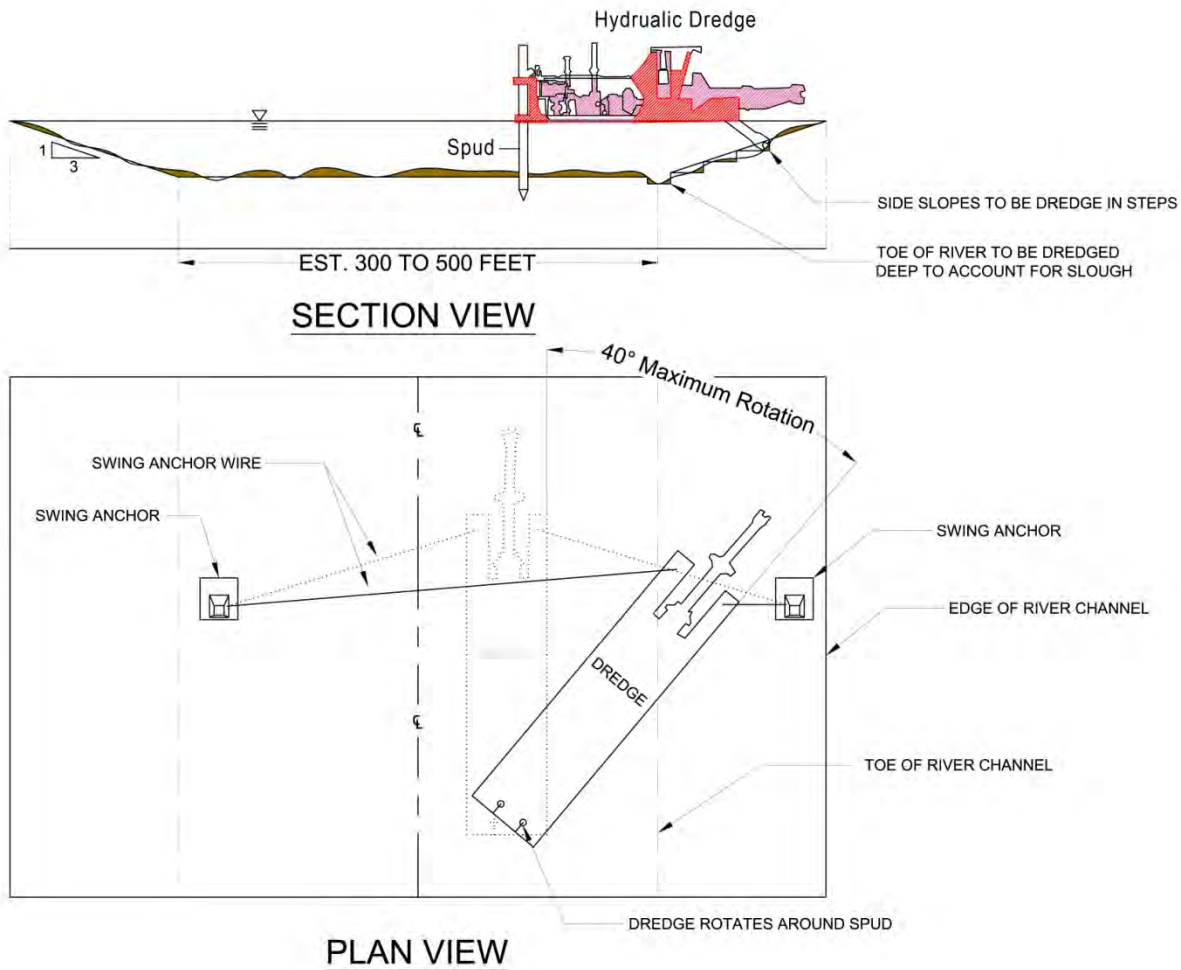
Schematic of a Hydraulic Cutterhead Dredge Plant
